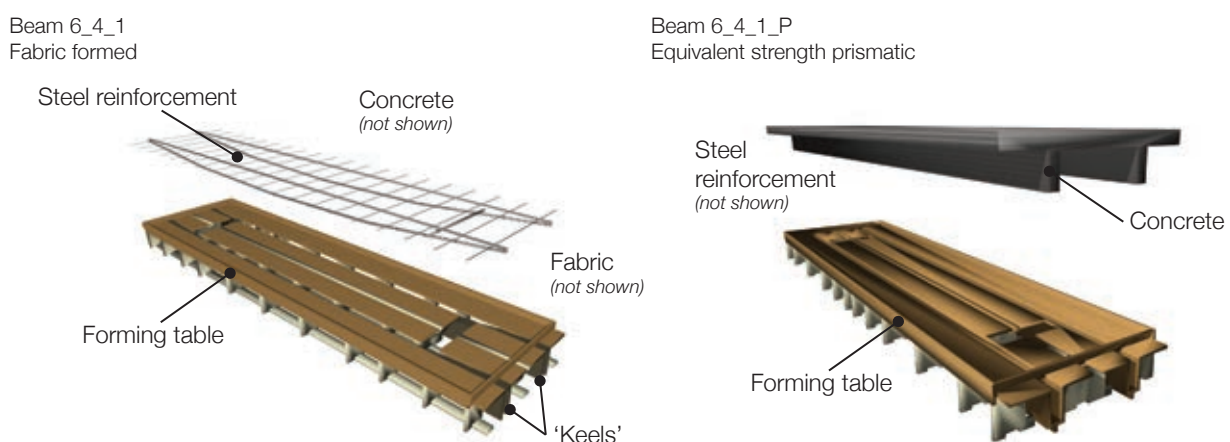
Materials used in the construction of Beam 6\_4\_1 and an equivalent strength prismatic section (denoted Beam 6\_4\_1\_P).
